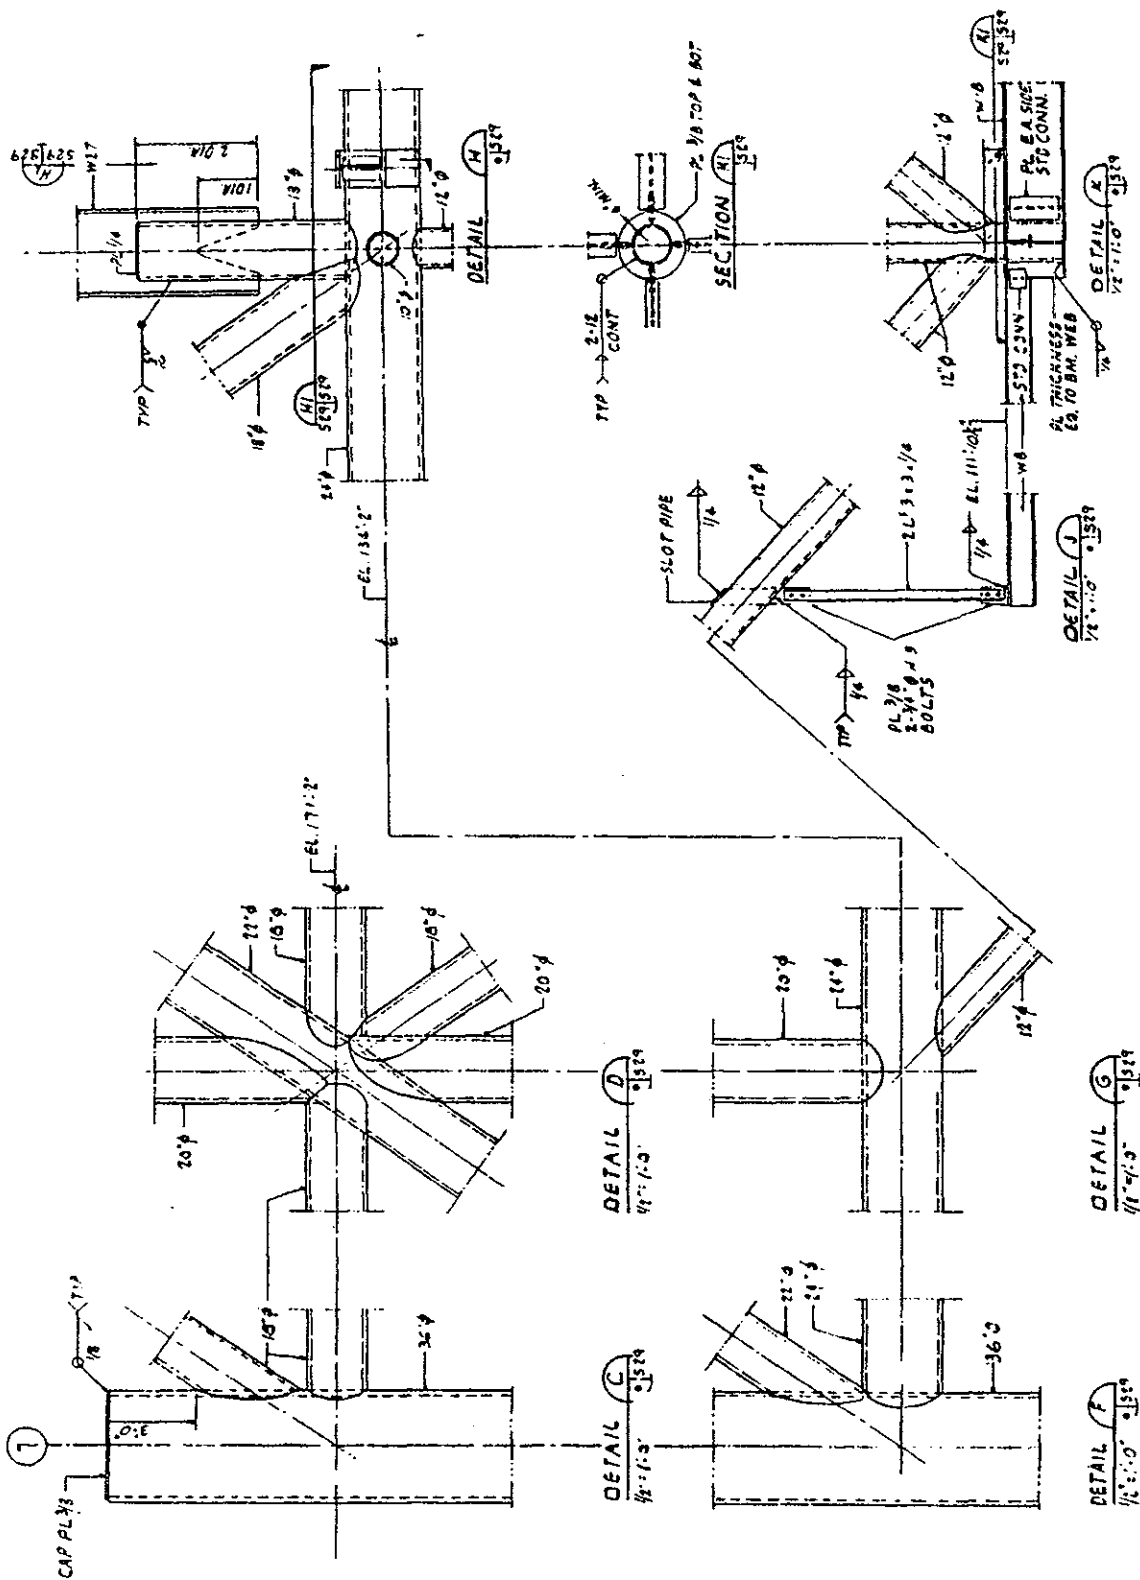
Structural Steel Drawing (Sheet 2 of 2)
